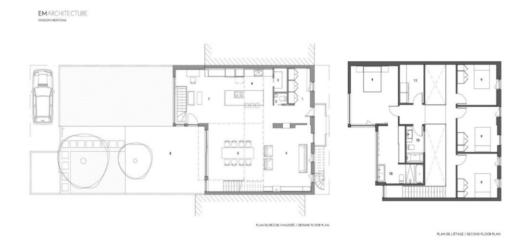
EM Architecture (2015). "Maison Mentana" Floor plans [Architectural plan drawing]. Montreal, Canada.
